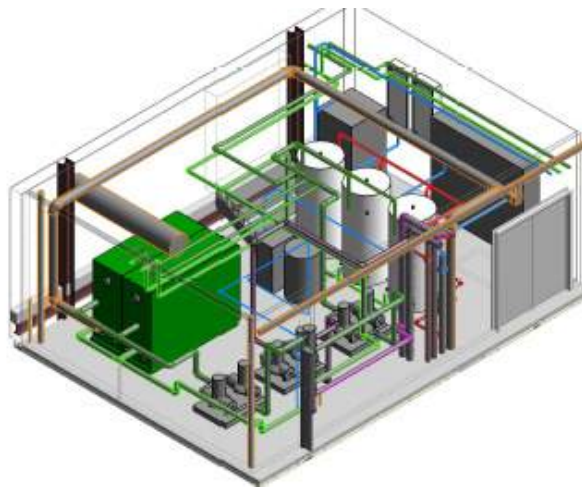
3D Second Floor Plantroom – Turing House School
